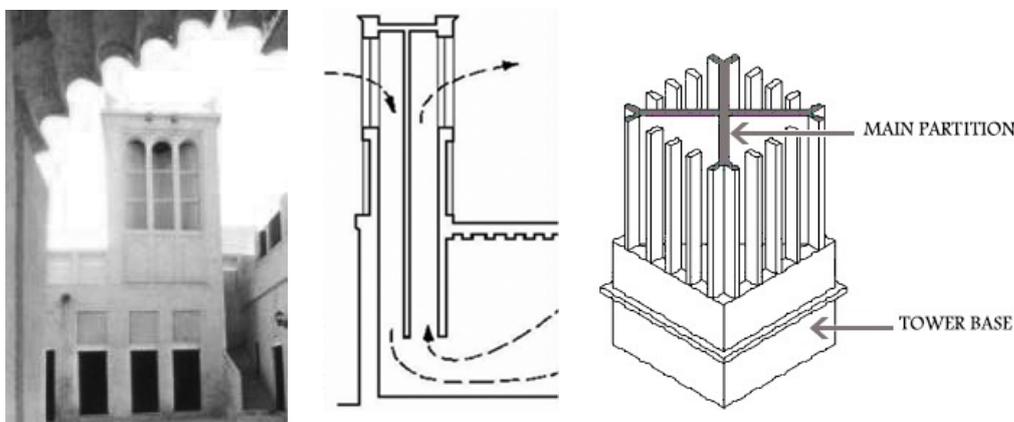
Section and 3D drawing of a vent tower or *badgeer*.
